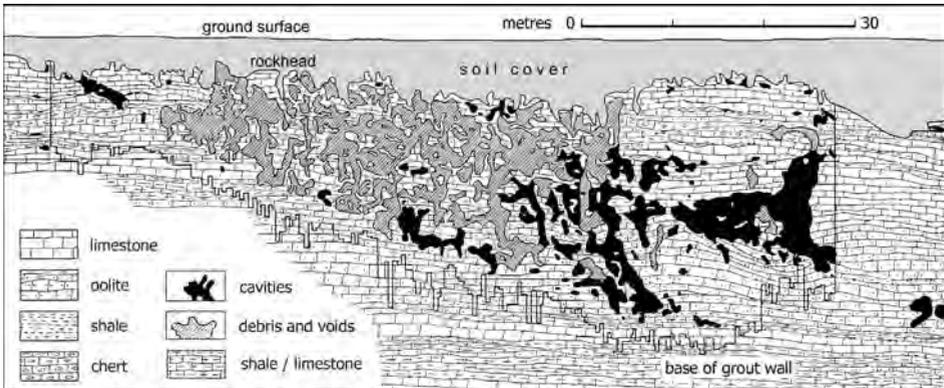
Cross section along the grout wall under one part of the Hales Bar Dam, Tennessee, where a zone of extensive, open and soil-filled, fissures and caves lay within the limestone.
